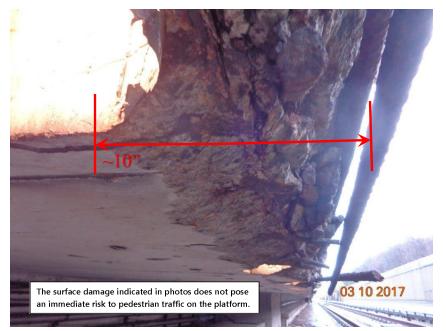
Close-up view from underside of platform edge. Most of spalls are within 5" from the edge of concrete. 10" is the limit for existing deterioration condition.
